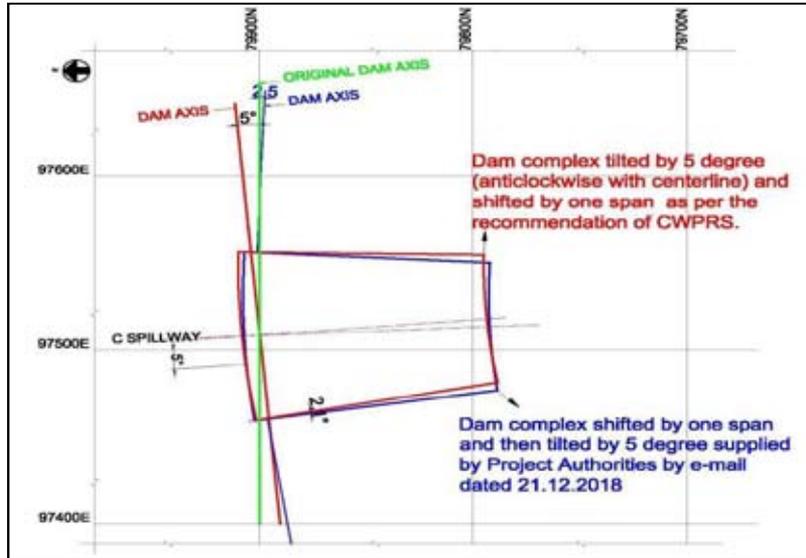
Superimposed Layout Plan Provided by Project Authorities & Recommended by CWPRS
